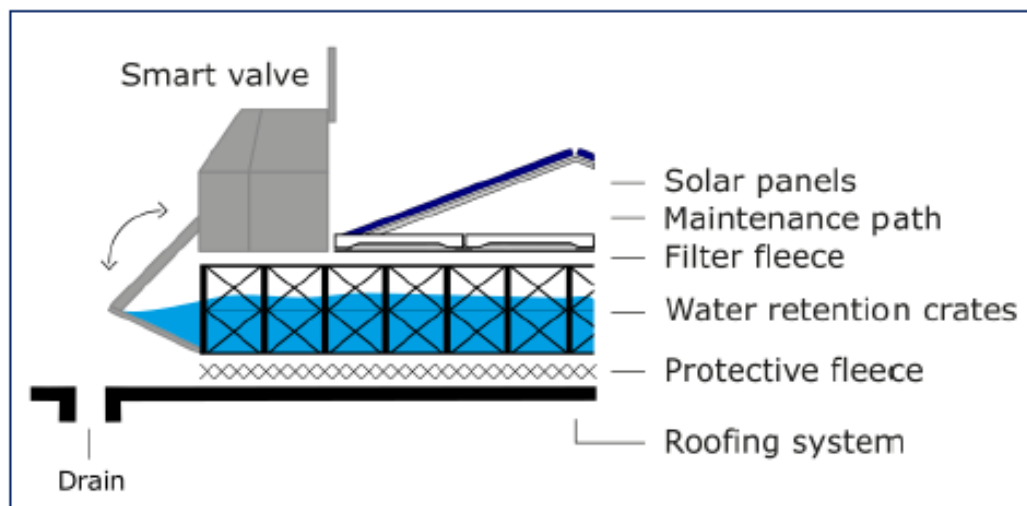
Schematic cross section of a Polderroof with solar panels (PV)
